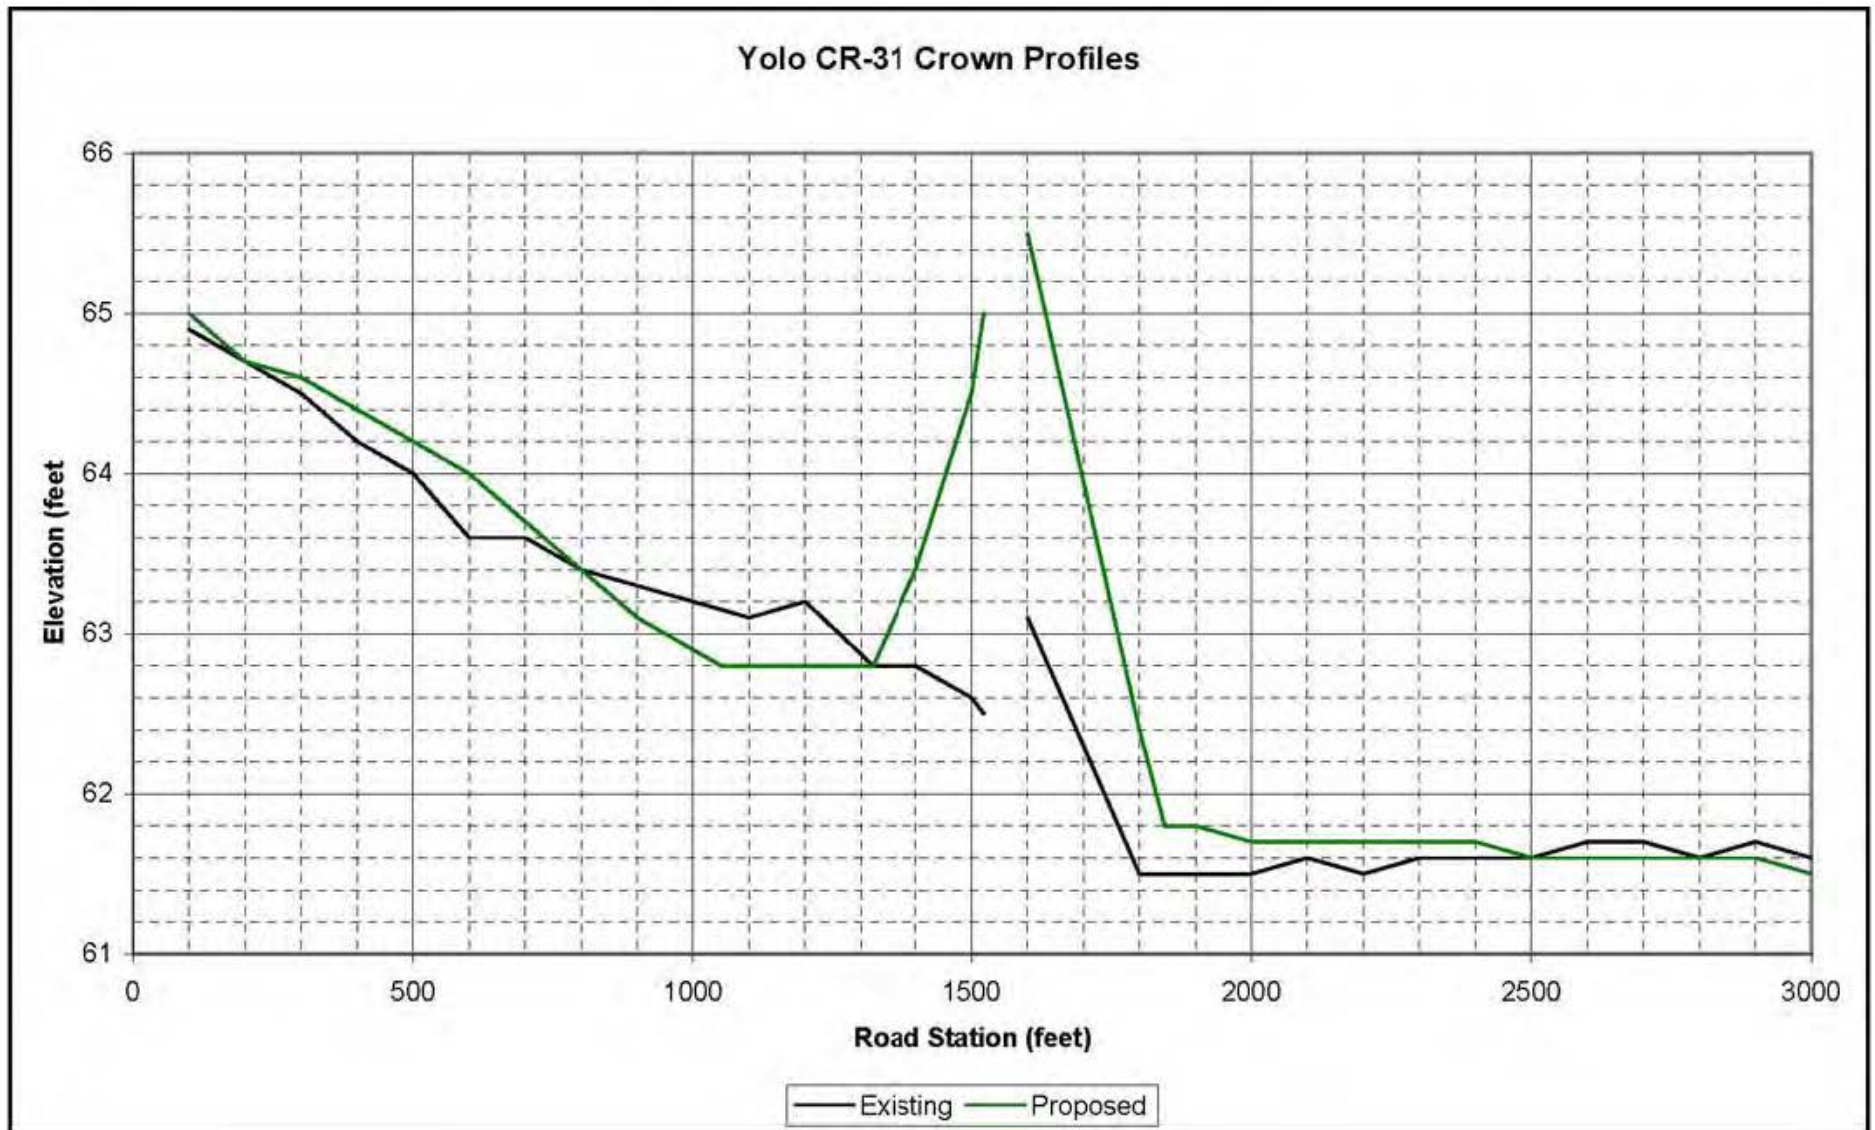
Existing and Proposed Condition Road Crown Profile, County Road 31
